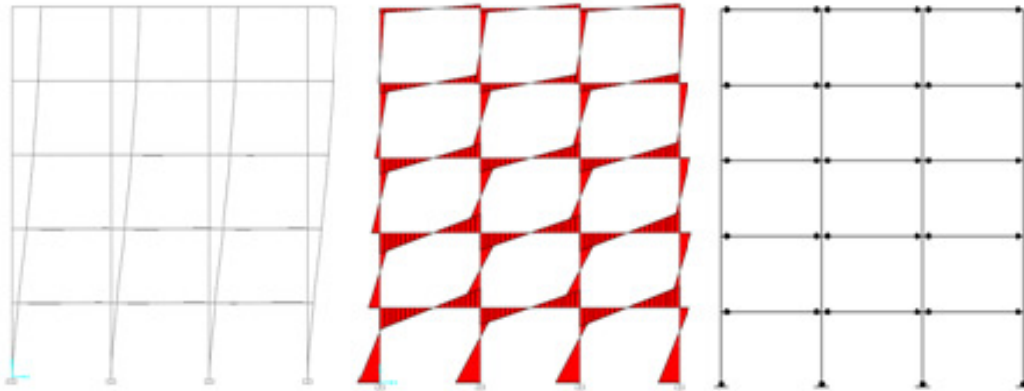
Deformed shape, moment diagram and location of plastic hinges observed under horizontal loading of a 5 storey moment resisting steel structure.
